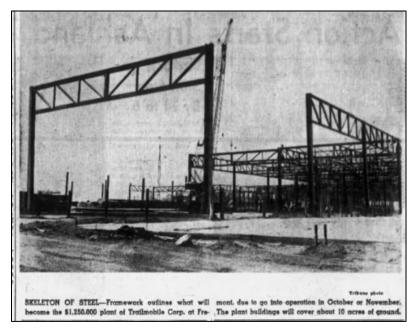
Photograph of Trailmobile manufacturing plant under construction, showing triangular framing pattern used throughout the building structure (Source: Oakland Tribune 1960).
